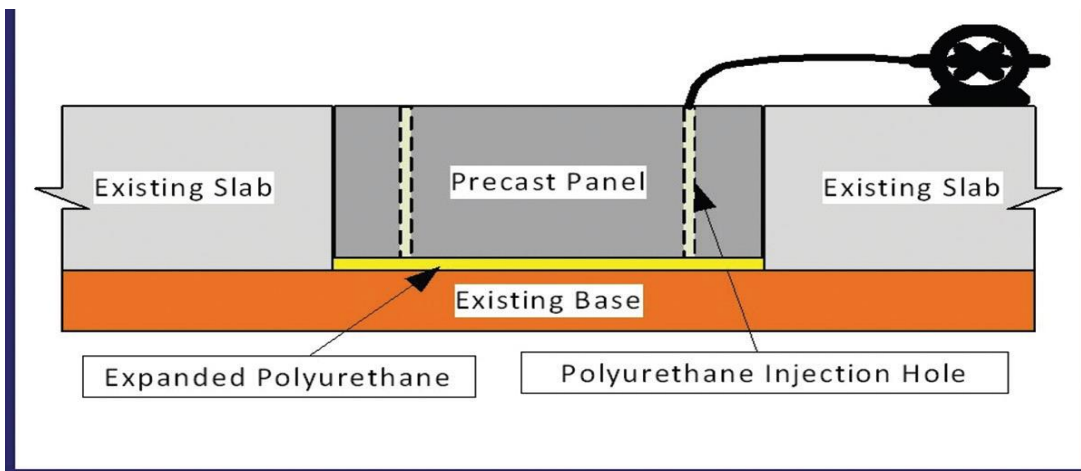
Placement of grade-supported precast panel for over-night use prior to installation of bedding grout
